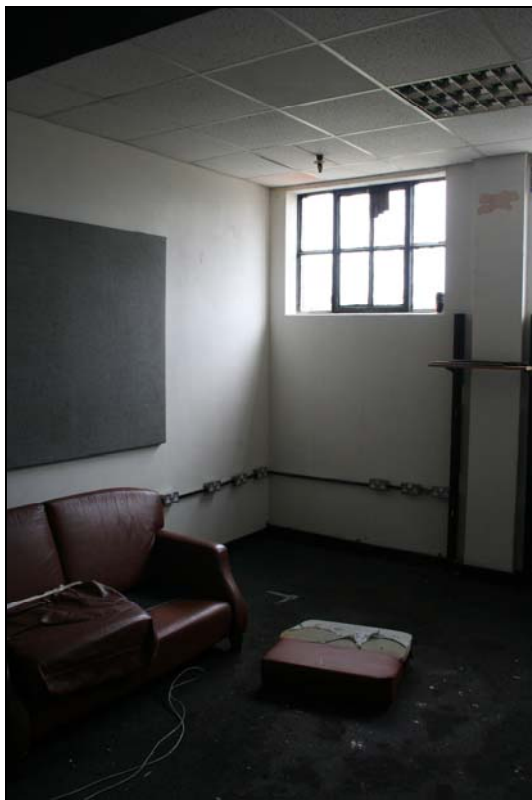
Building B, second floor, unit B212 (FCQ14-0139)
